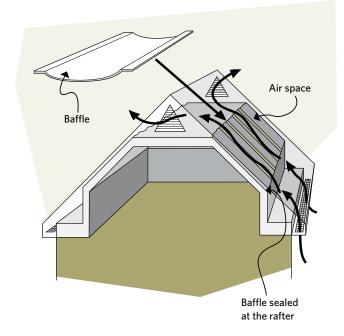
Ventilation occurs between sections through attic rafter vents installed in the rafter section
